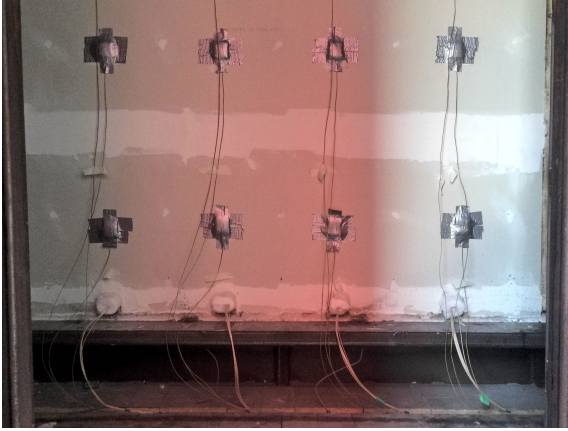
Finished wall, unexposed side, filled bottom gap.
